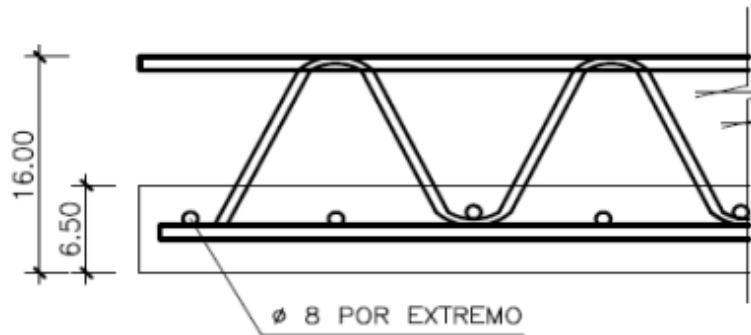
Structural configuration of panel reinforced with lattice girder
